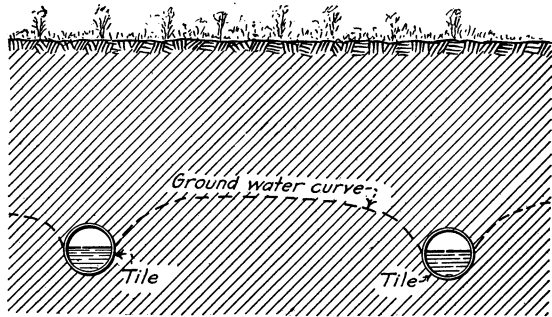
Cross section through soil, showing profile of ground-water surface between drains.
